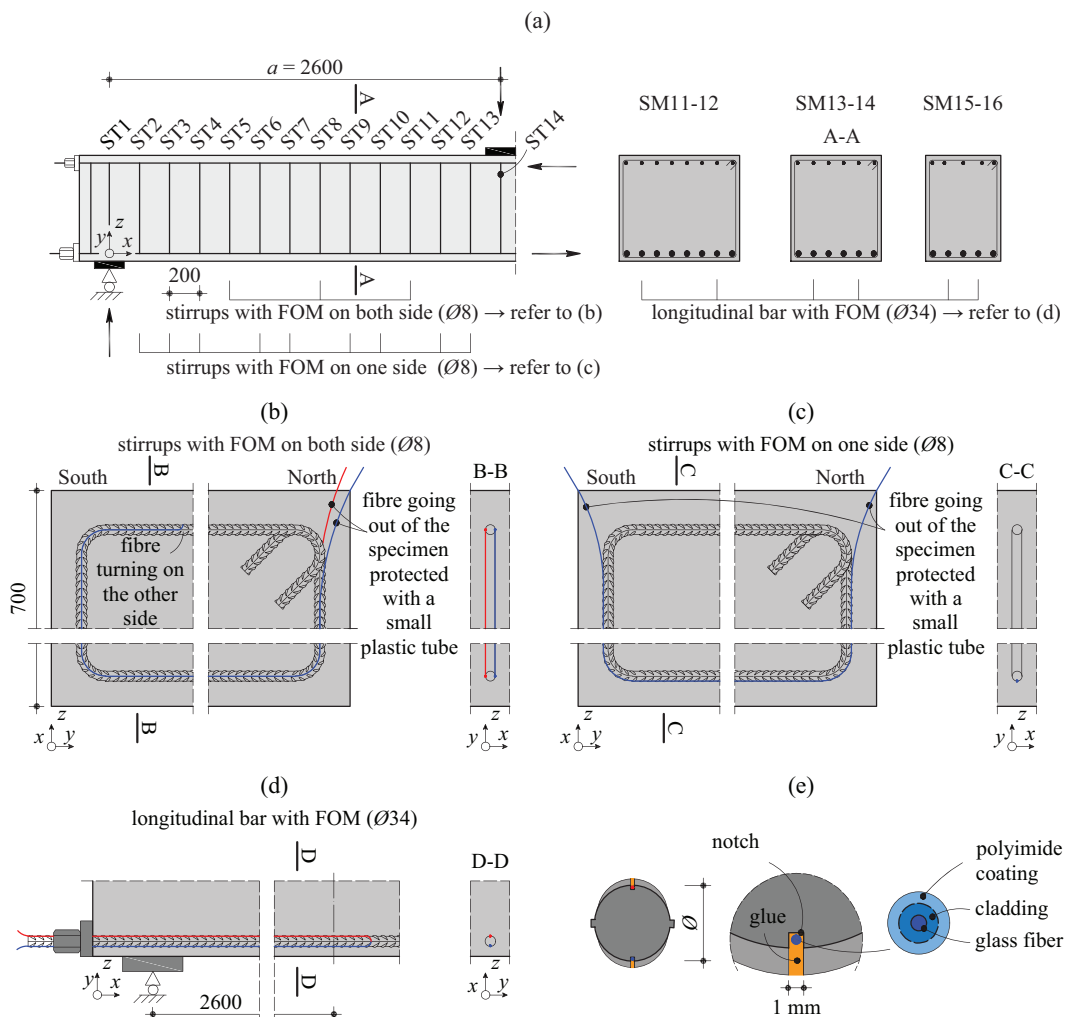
Fibre-Optical Measurement: (a) instrumented bars; (b) positions on the stirrups with two fibres; (c) position on the stirrups with one fibre; (d) position on the flexural reinforcement; and (e) detail of installation.
